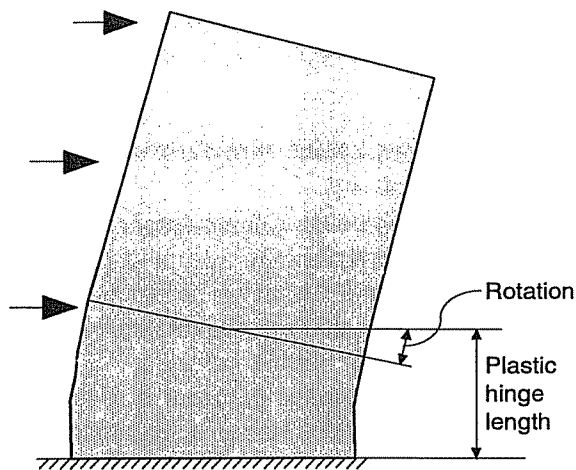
Plastic Hinge Rotation in a Wall or Wall Segment Governed by Flexure
